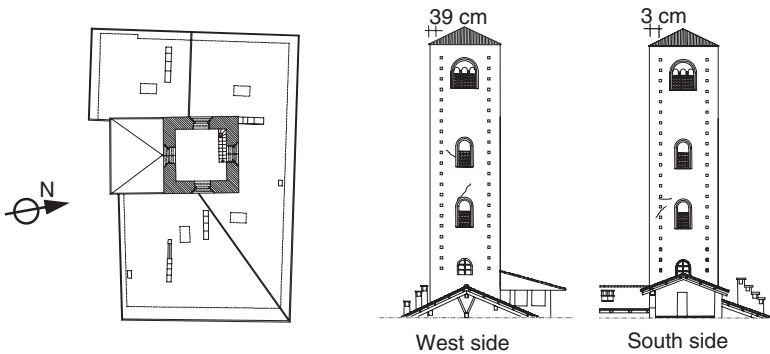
Torre Sineo. Plan and elevations of two sides of the tower. Notice the presence of cracks near the openings and the deviation from verticality of the tower.
